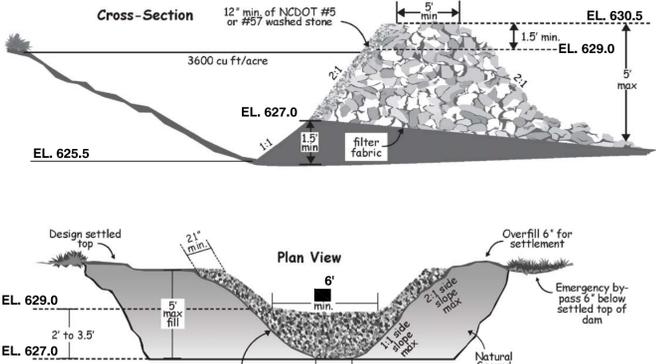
Plan view and cross-section view of a temporary sediment trap.
